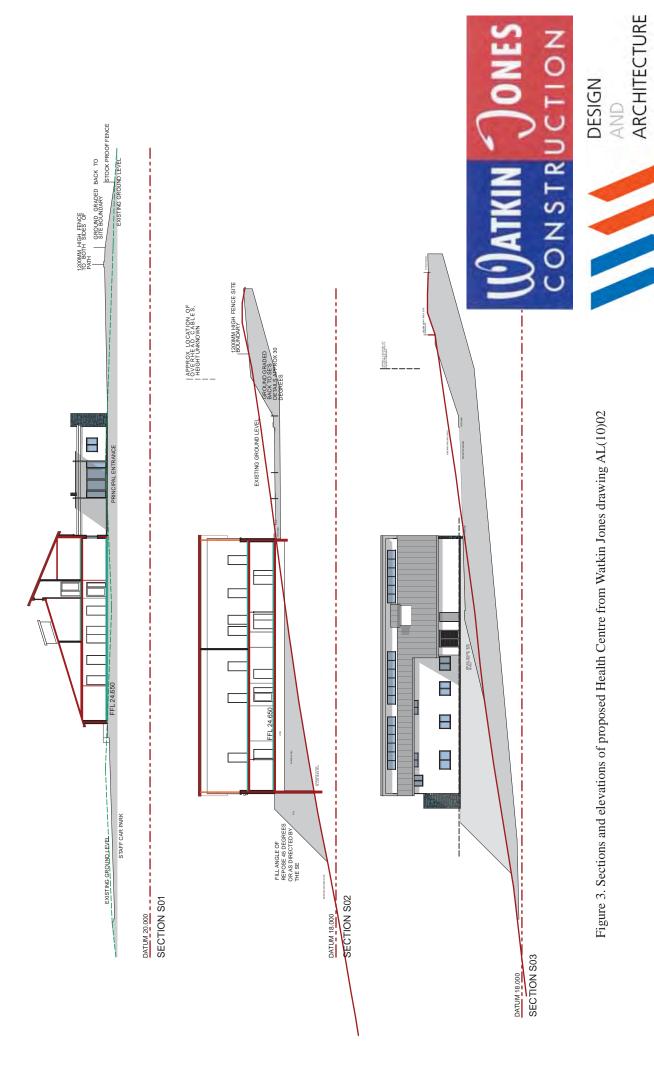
Sections and elevations of proposed Health Centre from Watkin Jones drawing AL(10)02
